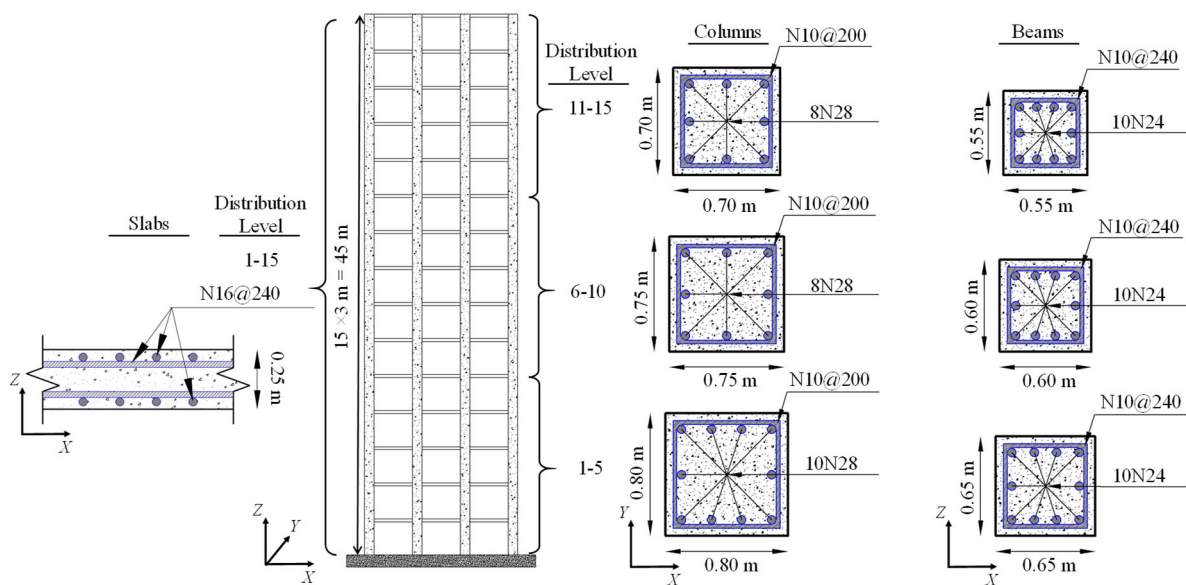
Designed structural sections and reinforcement details of columns, beams, and slabs
